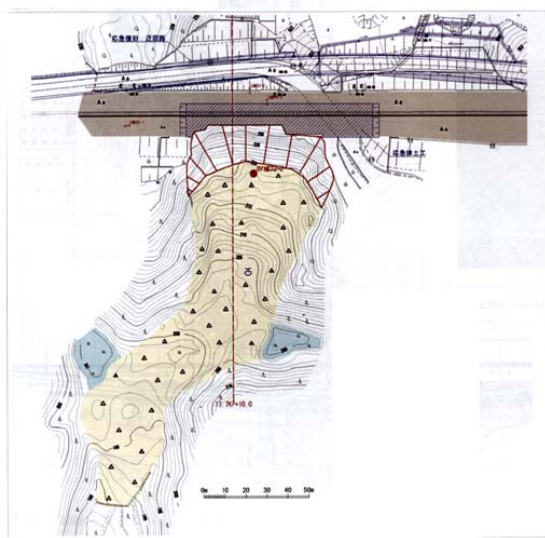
Plan at site No.32 (by Ishikawa Pref.)
